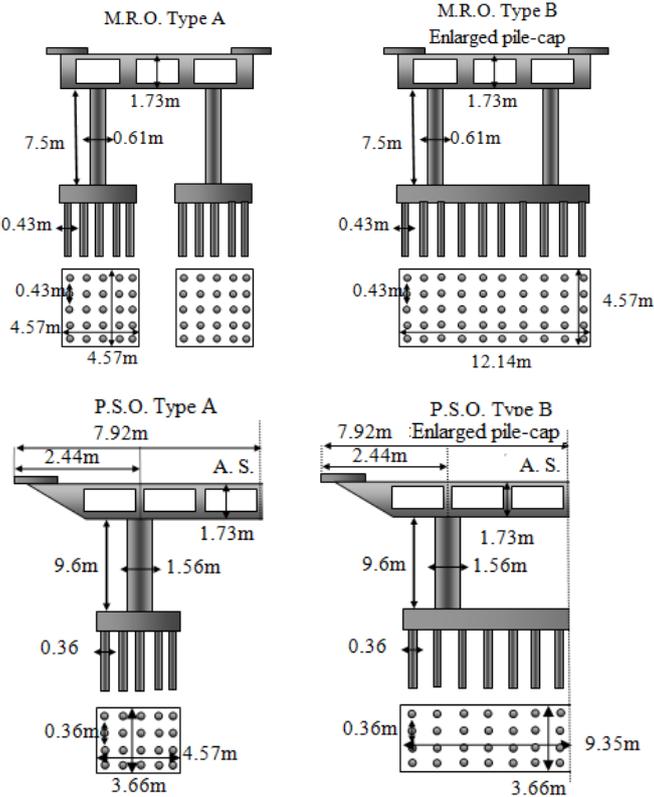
Alternative pilecap configurations under examination (MRO and PSO)
